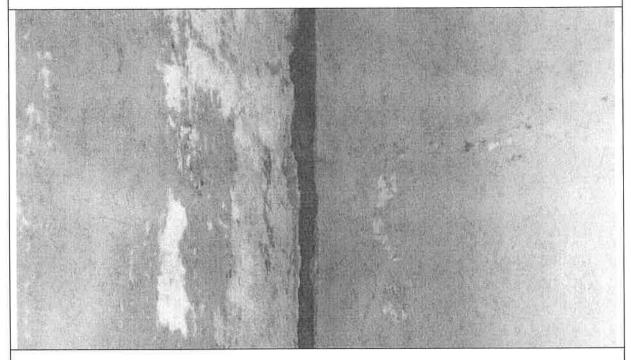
End of Interior Bearing Wall at Face of East Exterior Wall – Note separation indicative of out of plane wall displacement.
